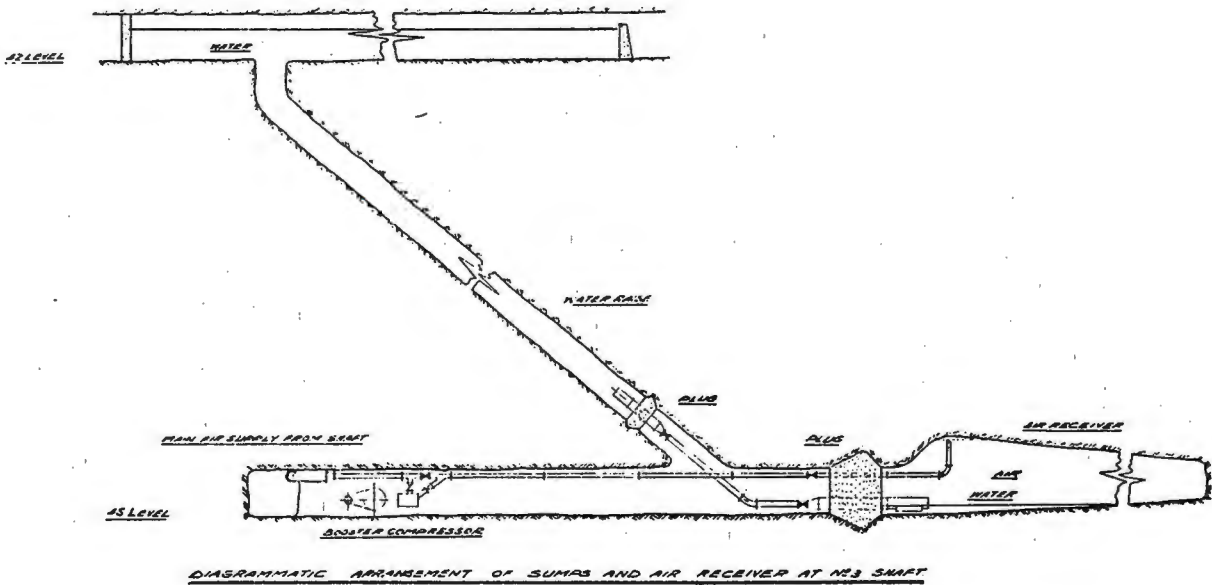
Air receiver installed at Welkom No.3 shaft using booster compressors⁽¹⁰⁾
